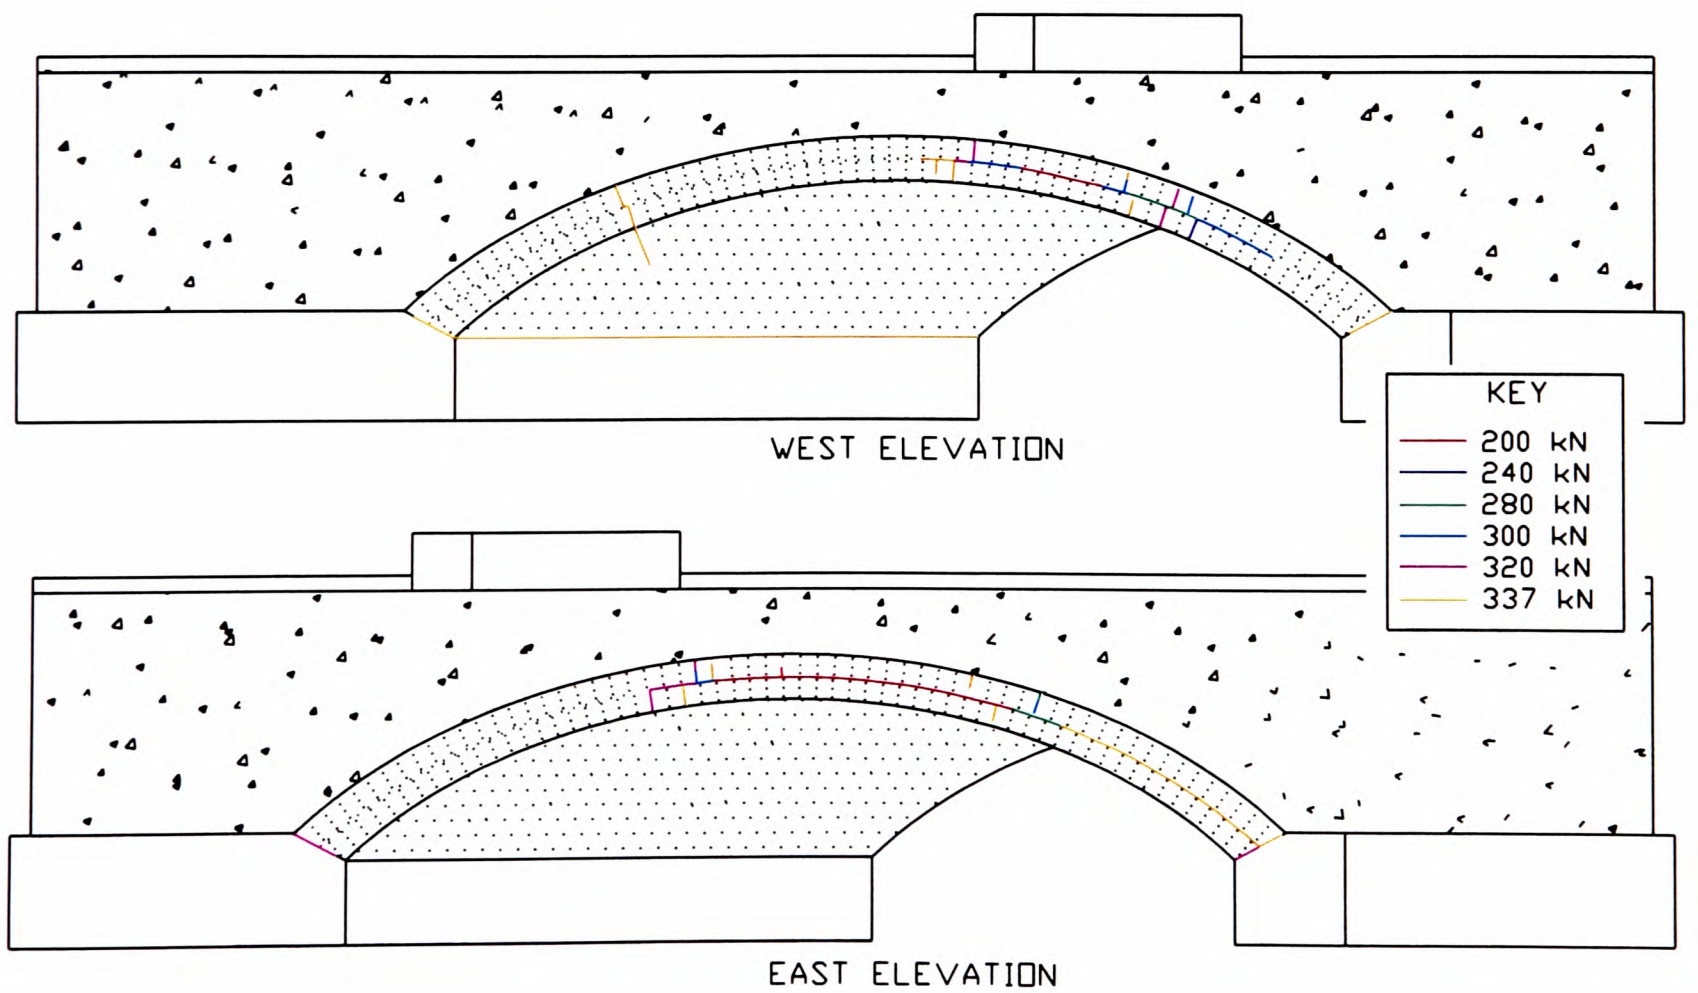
Development of cracks up to failure within skewed arch 3-4
